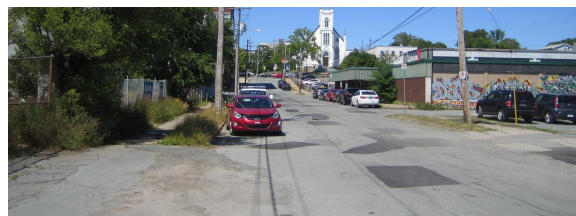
Looking north on Canal Street towards Mill Lane and Portland Street from the proposed site driveway at the south site boundary.
